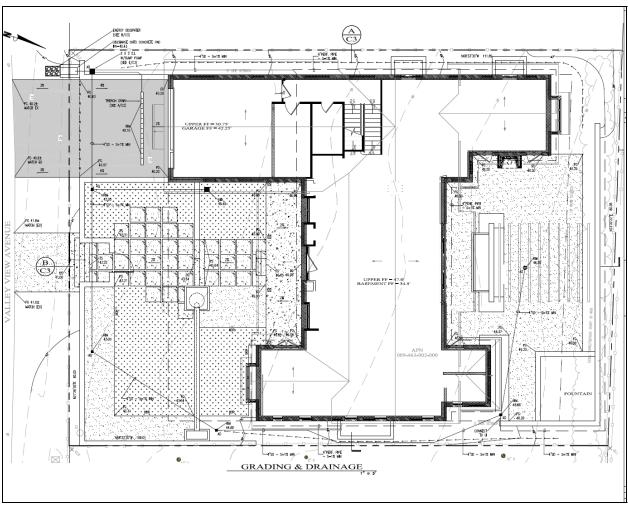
Grading and Drainage [1255 cubic yards of grading are estimated for the implementation of the project as proposed. Excavation for the basement is expected to be to a depth of 13 feet].
